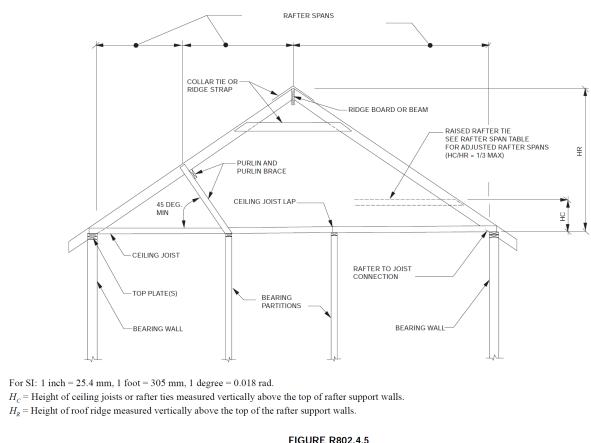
BRACED RAFTER CONSTRUCTION
